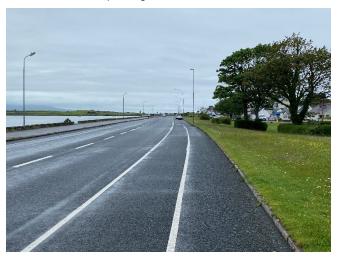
Location of proposed parking resurfacing, raised table crossing and planting outside Driftwood
